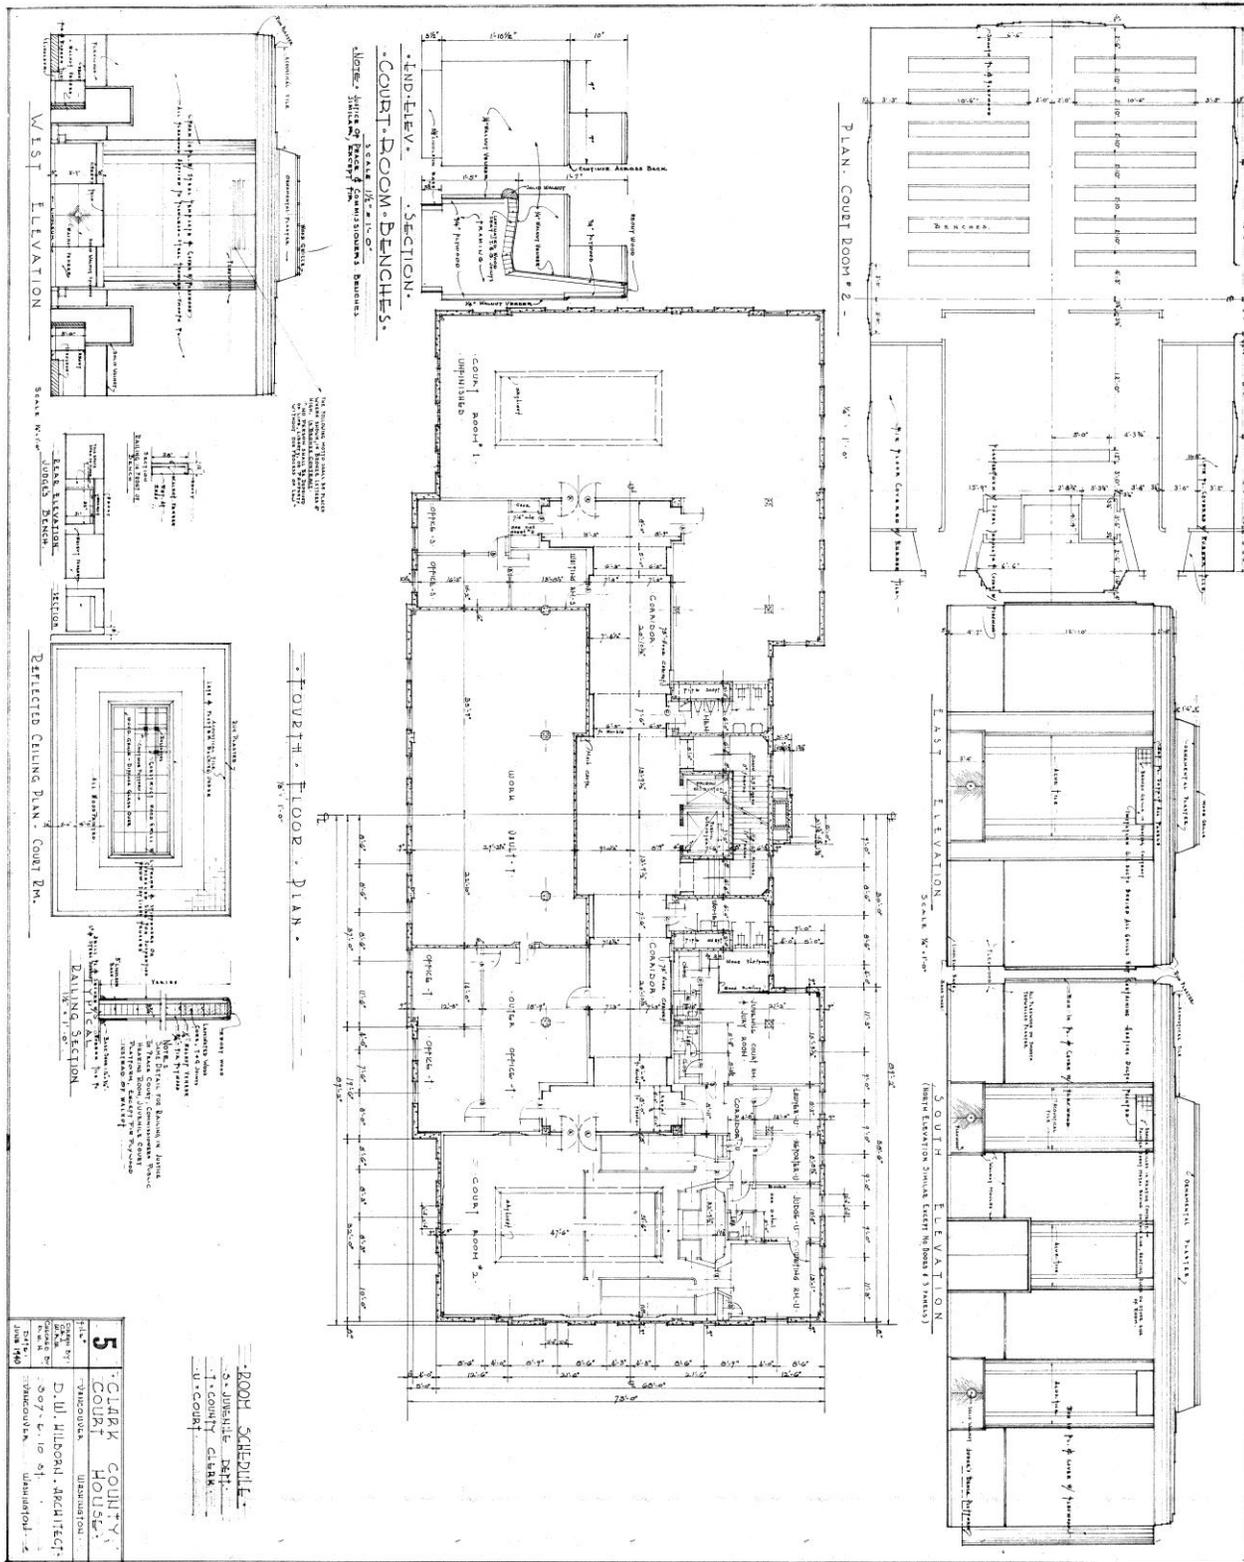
Courthouse Floor Plan Drawing – Fourth Floor & Courtroom details
